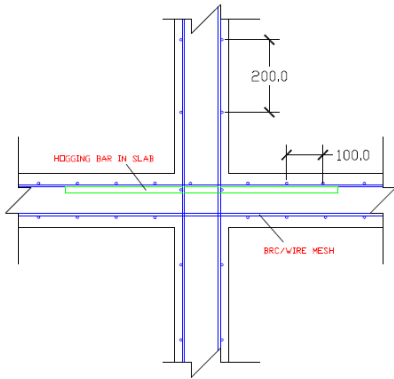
Reinforcement detail of Interior Wall-slab joint (dimension in mm).
